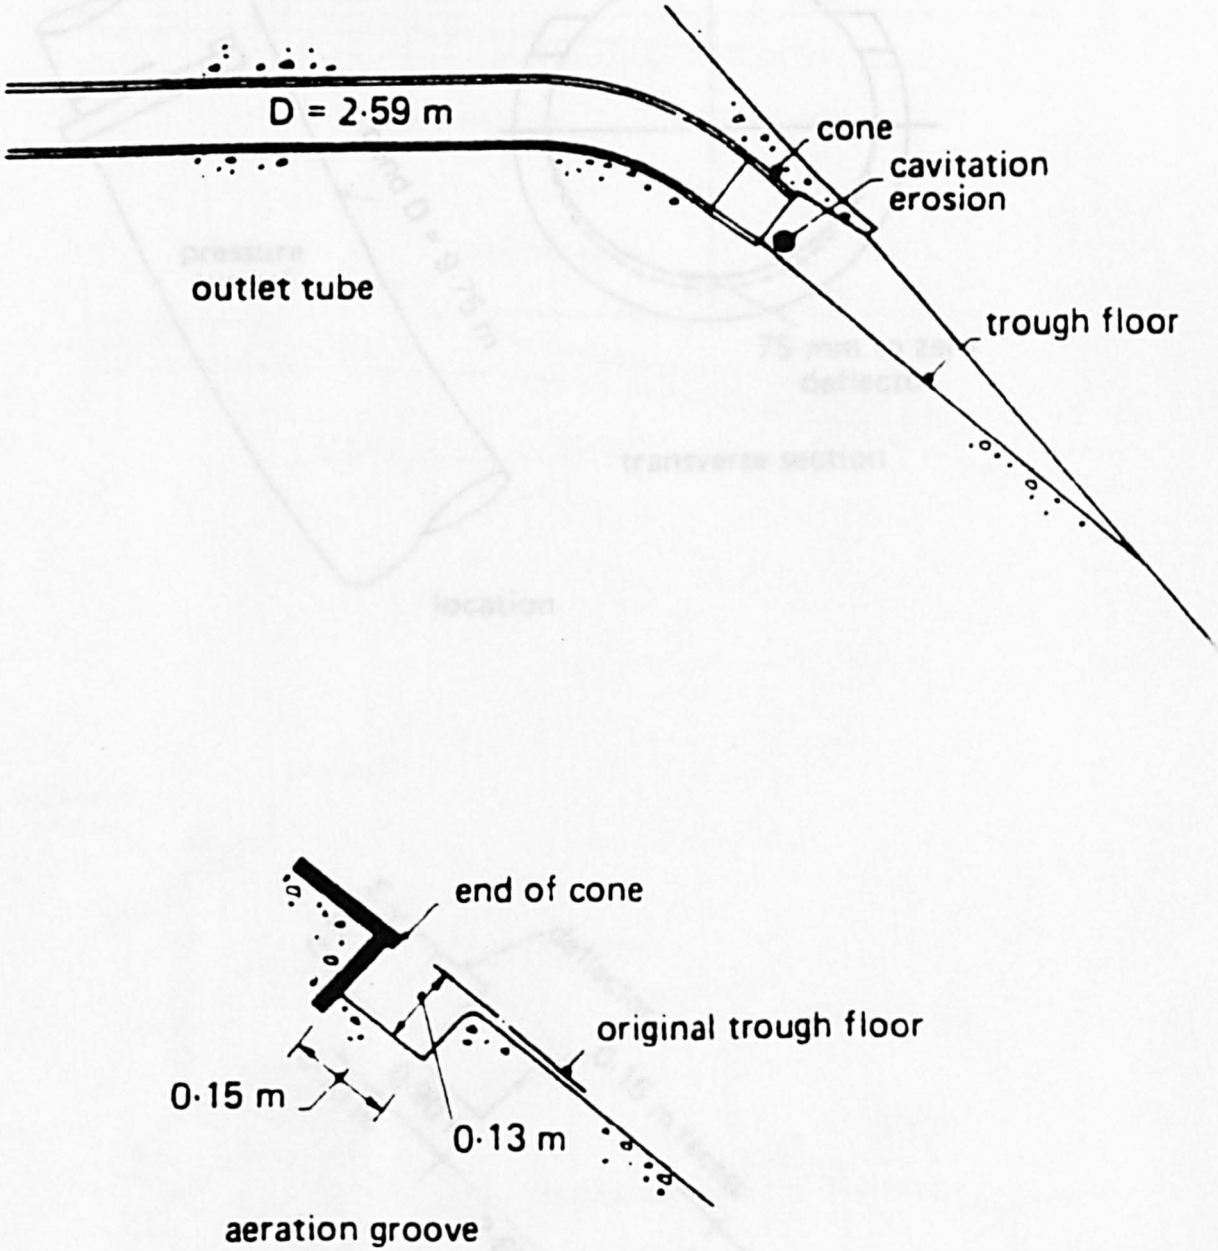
Details of Grand Coulee Dam outlet Structure
